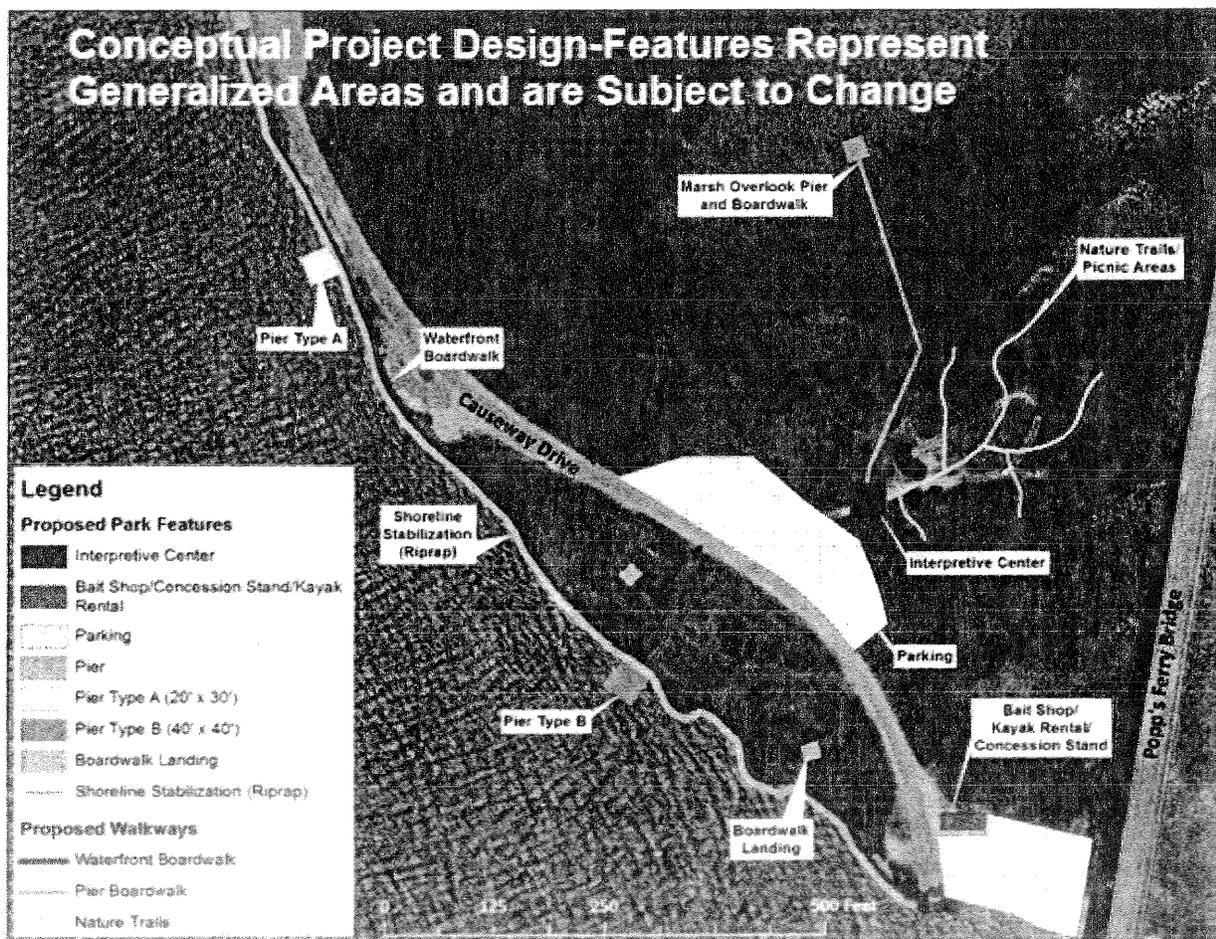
2 - Popp's Ferry Causeway Park project features-Conceptual Plan.
